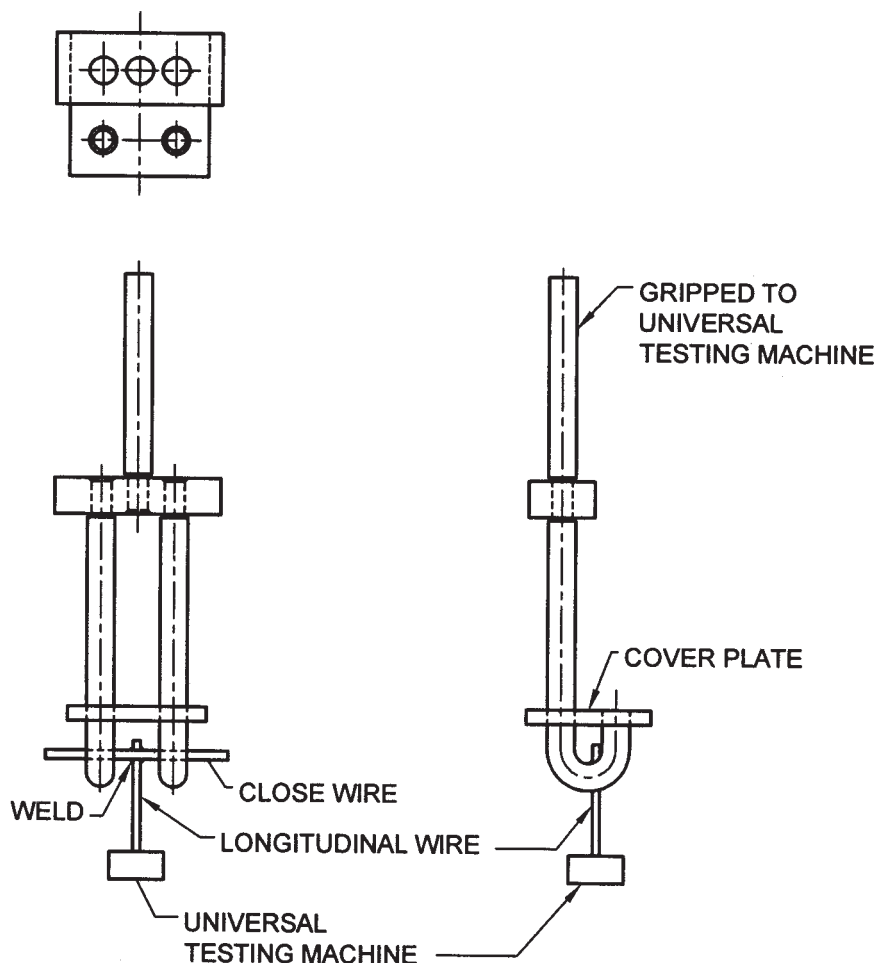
WELDED WIRE FABRIC WELD TESTER
